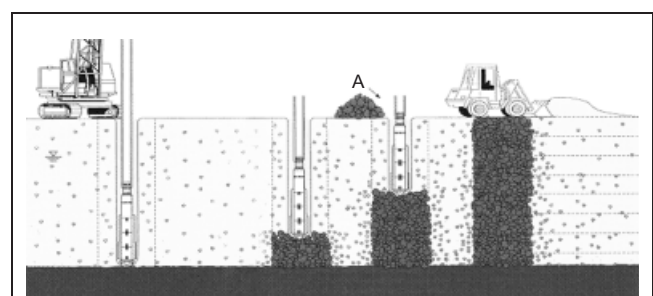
Schematic illustrating the stone column installation process (courtesy of Keller)
